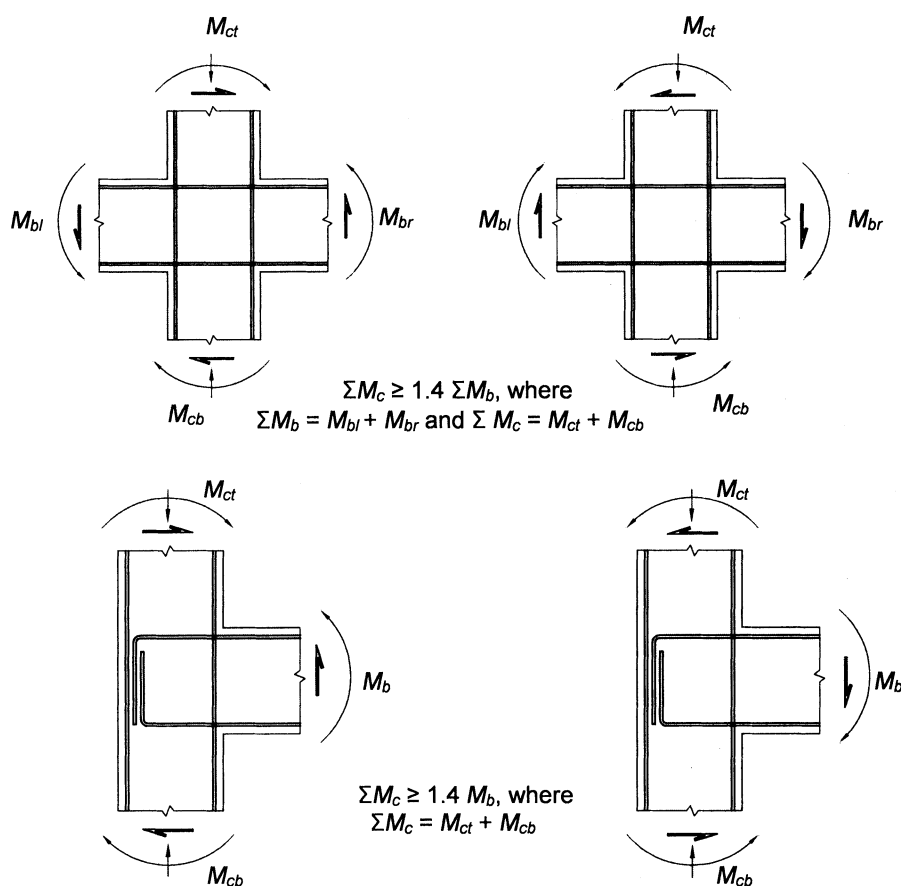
STRONG COLUMN – WEAK BEAM REQUIREMENT
